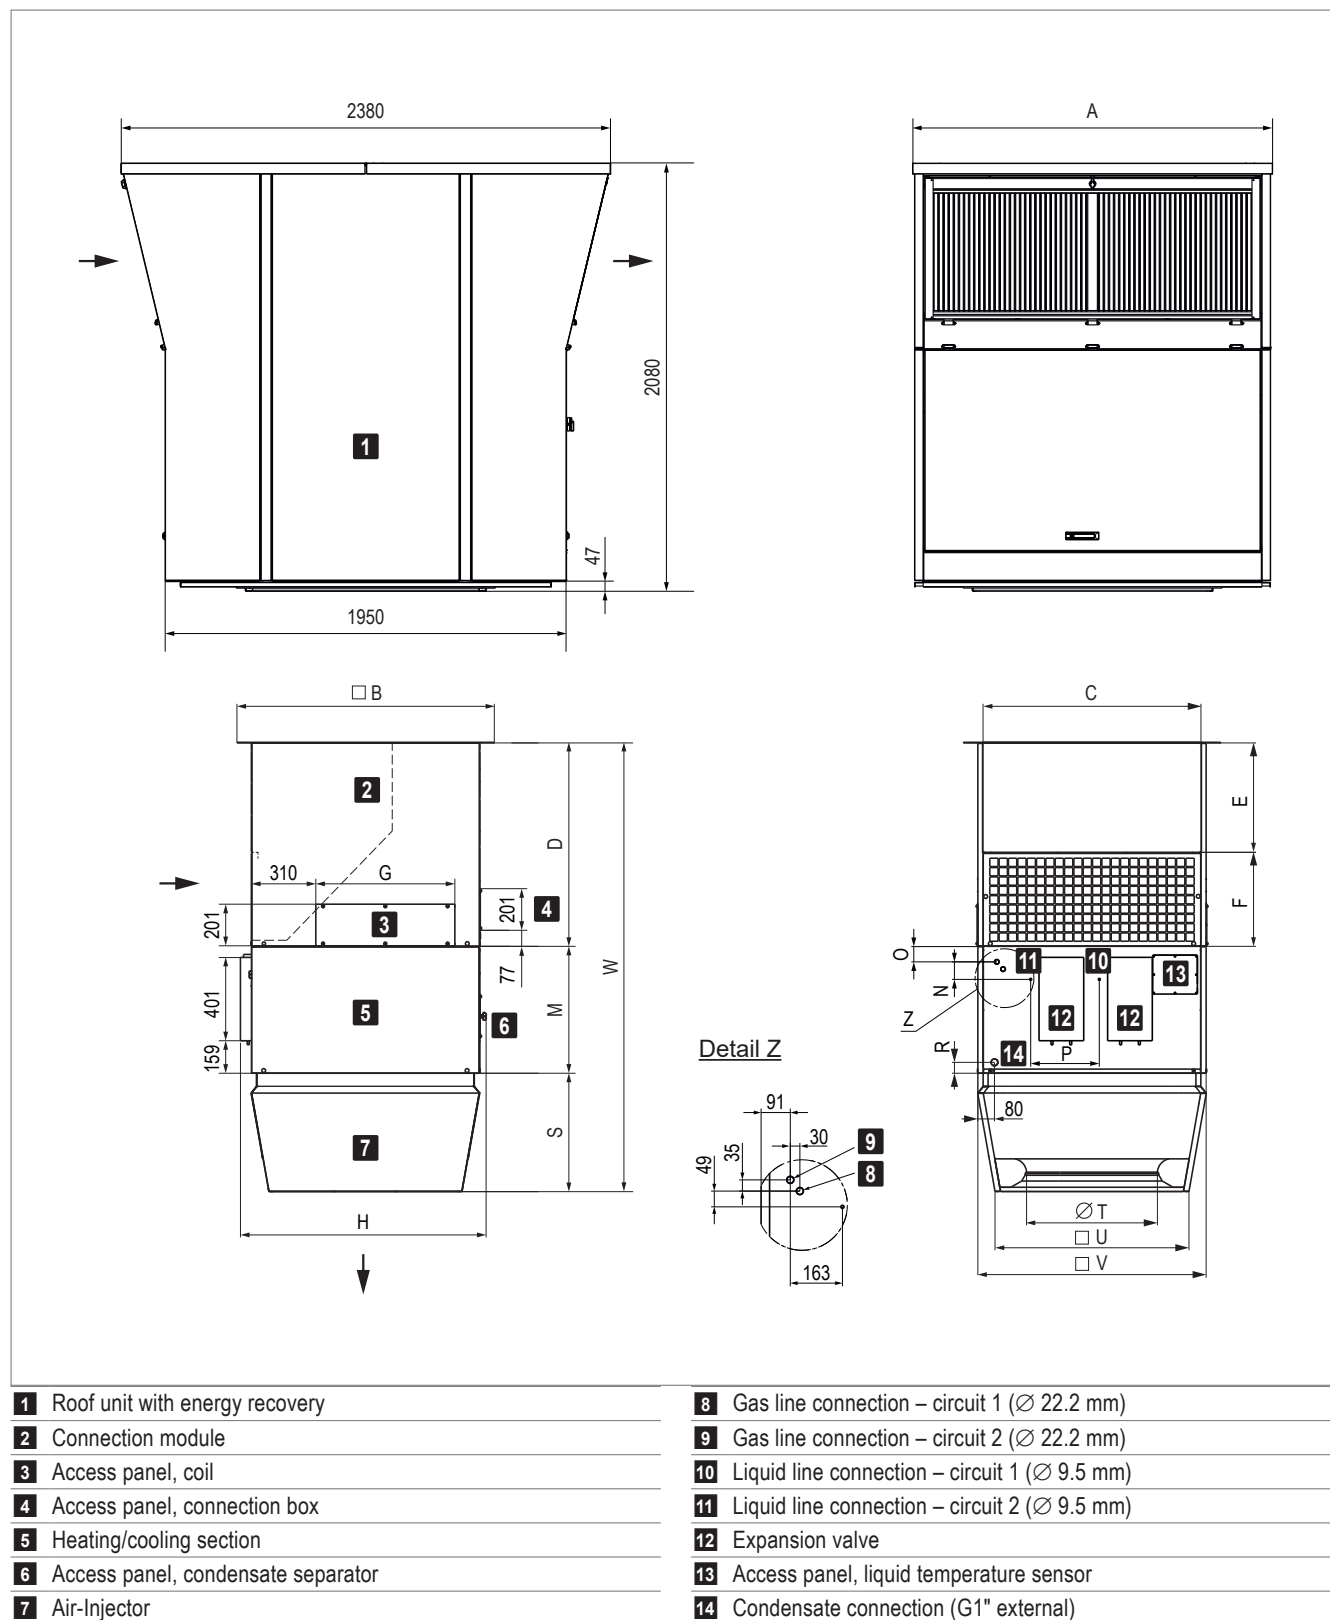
RoofVent® RP-9-M dimensional drawing (dimensions in mm)
